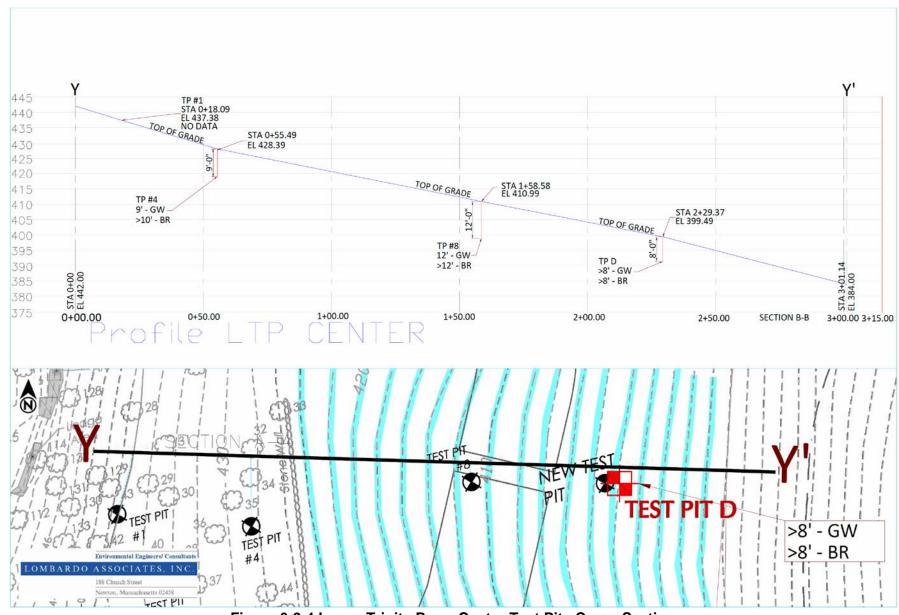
Lower Trinity Pass, Center Test Pits Cross-Section
